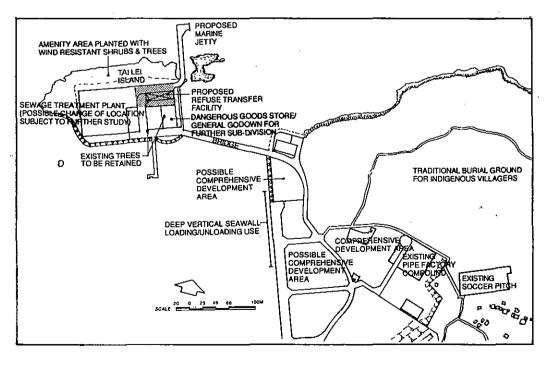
PENG CHAU TRANSFER FACILITY LOCATION PLAN
